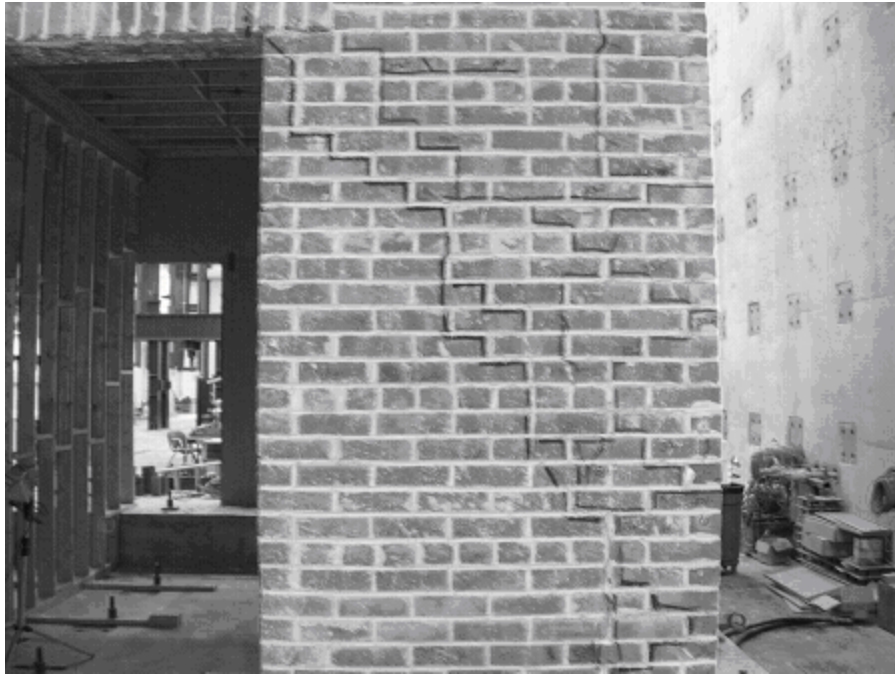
Photograph showing the diagonal crack in pier P1-7 following Test Run 19.
